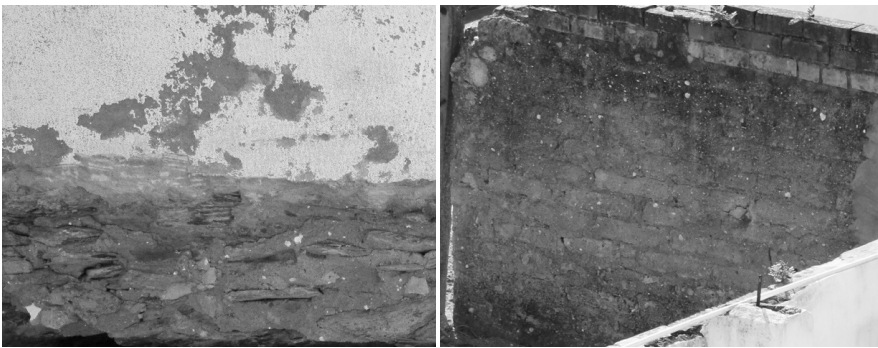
Materials used in Ovar's constructions. (left) mix of stone gravel and clay wall; (right) adobe wall.
